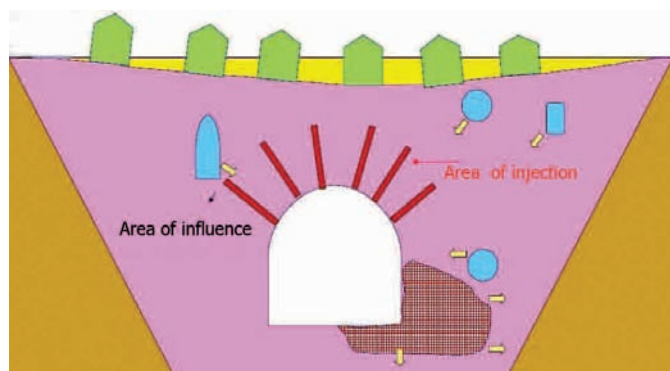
geotechnical influence area (in pink) for a shallow tunnel (source: CETU)
